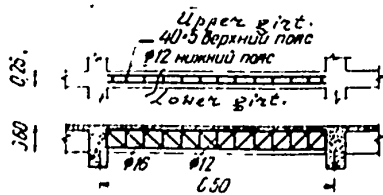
Rigid steel welded skeleton of the floor supporting beam.
